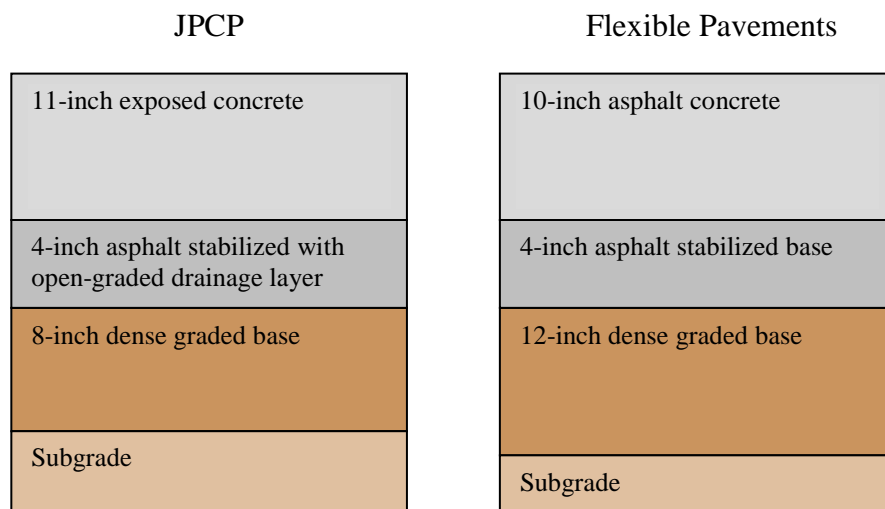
Highway 407 case study: structural designs of pavement alternatives.
